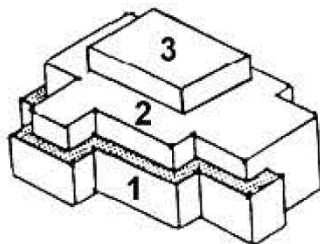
BUILDING OFFSETS AND ARTICULATION
